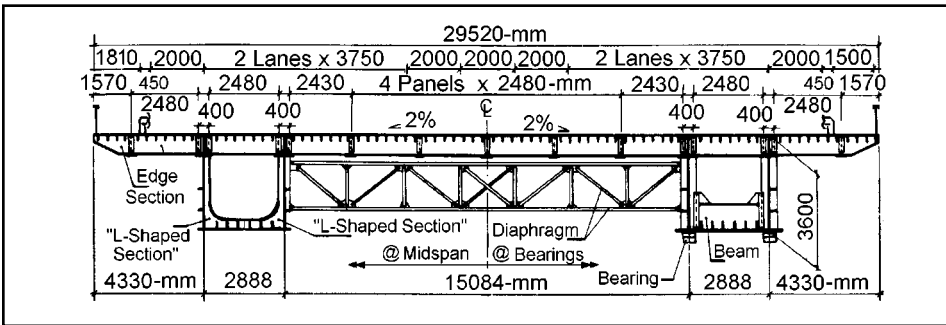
Twin box girder bridge crossing the Oka River, Russia (split-section).
